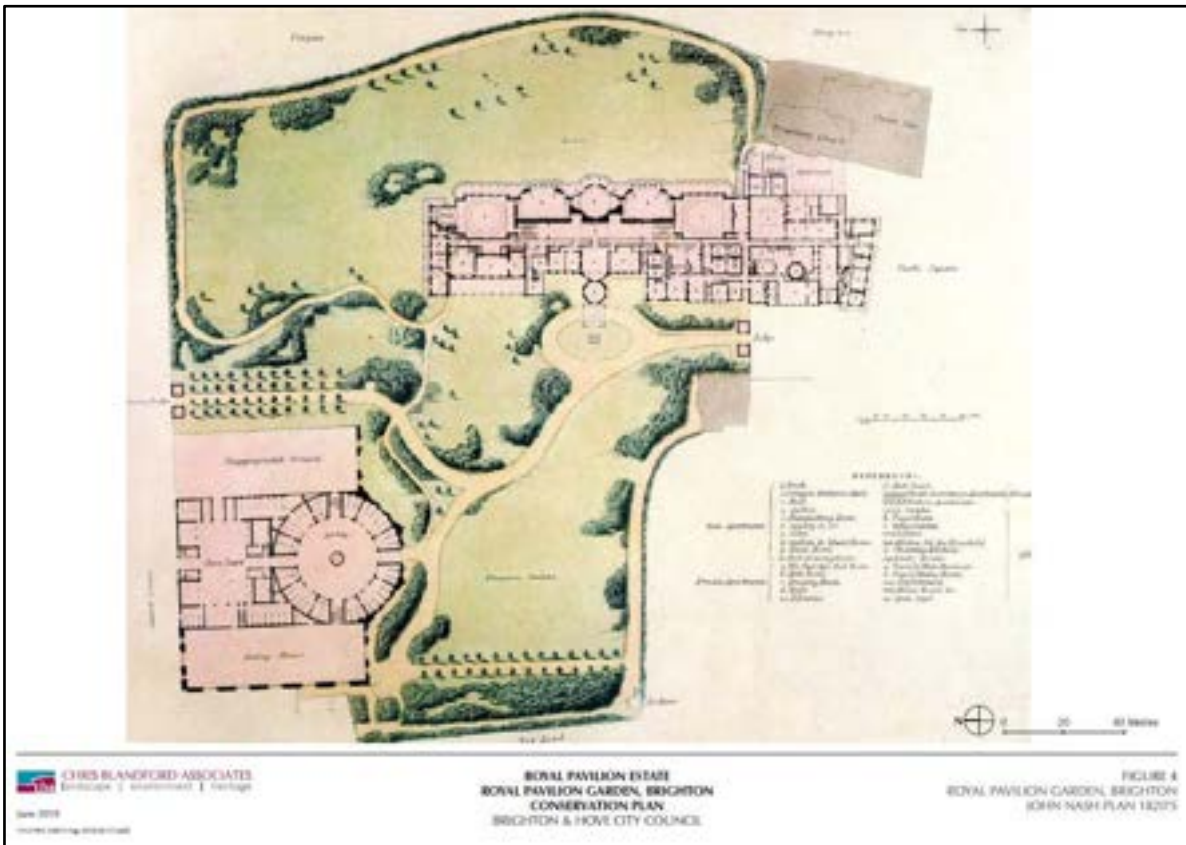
John Nash Garden Plan, published in *Views*, 1826 (CBA, 2018), based on an earlier sketch plan of c.1815-22.
